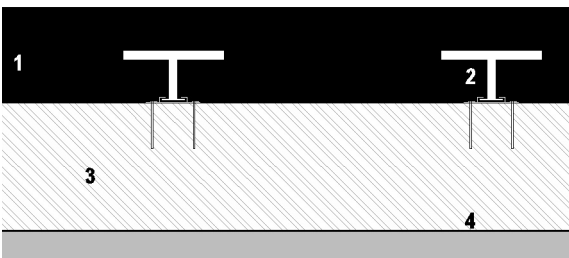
Sliding anchors. Horizontal section. (1) poured earth; (2) sliding anchor; (3) load bearing concrete wall; (4) bitumen
